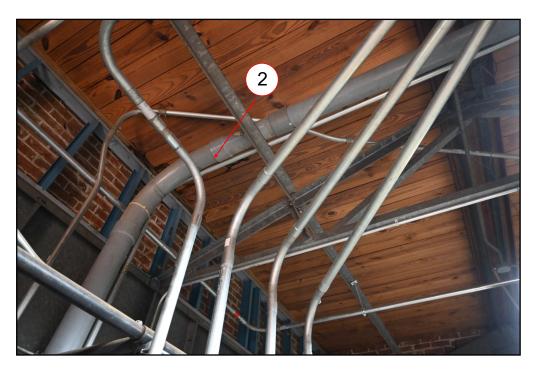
Routing of 4" PVC conduit to FAA Avionics Building
